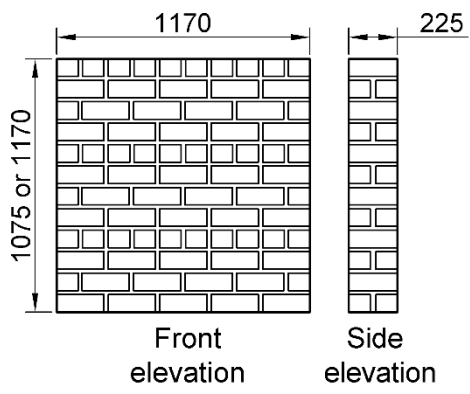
Wallette dimensions (mm) and masonry bond pattern.
